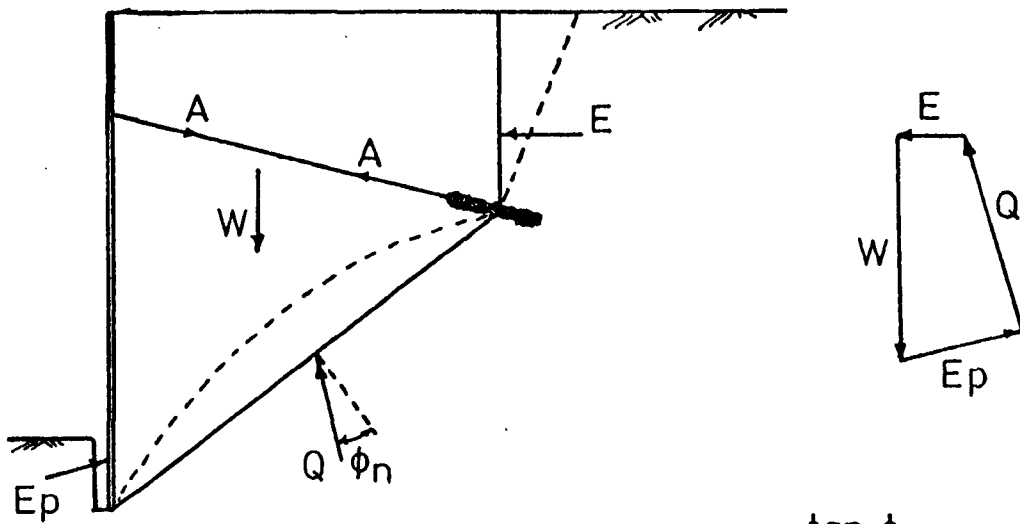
COMPLEX FRACTURE SURFACE
